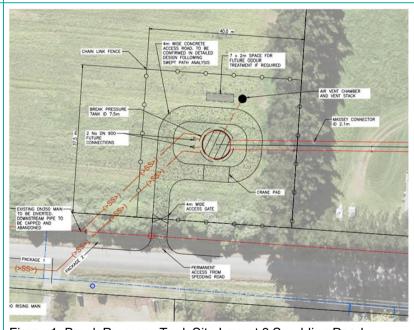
Break Pressure Tank Site Layout 8 Spedding Road
